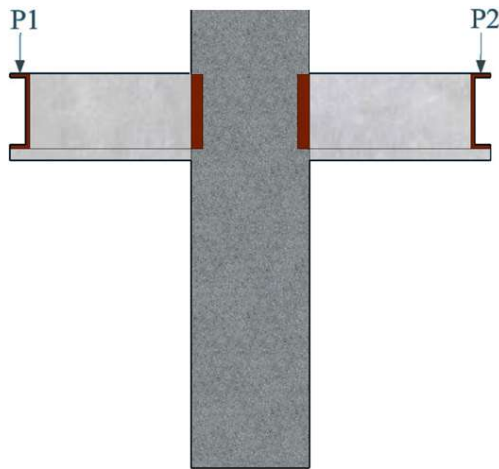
Designed (favorable) positions of steel profile with reference to RC column
